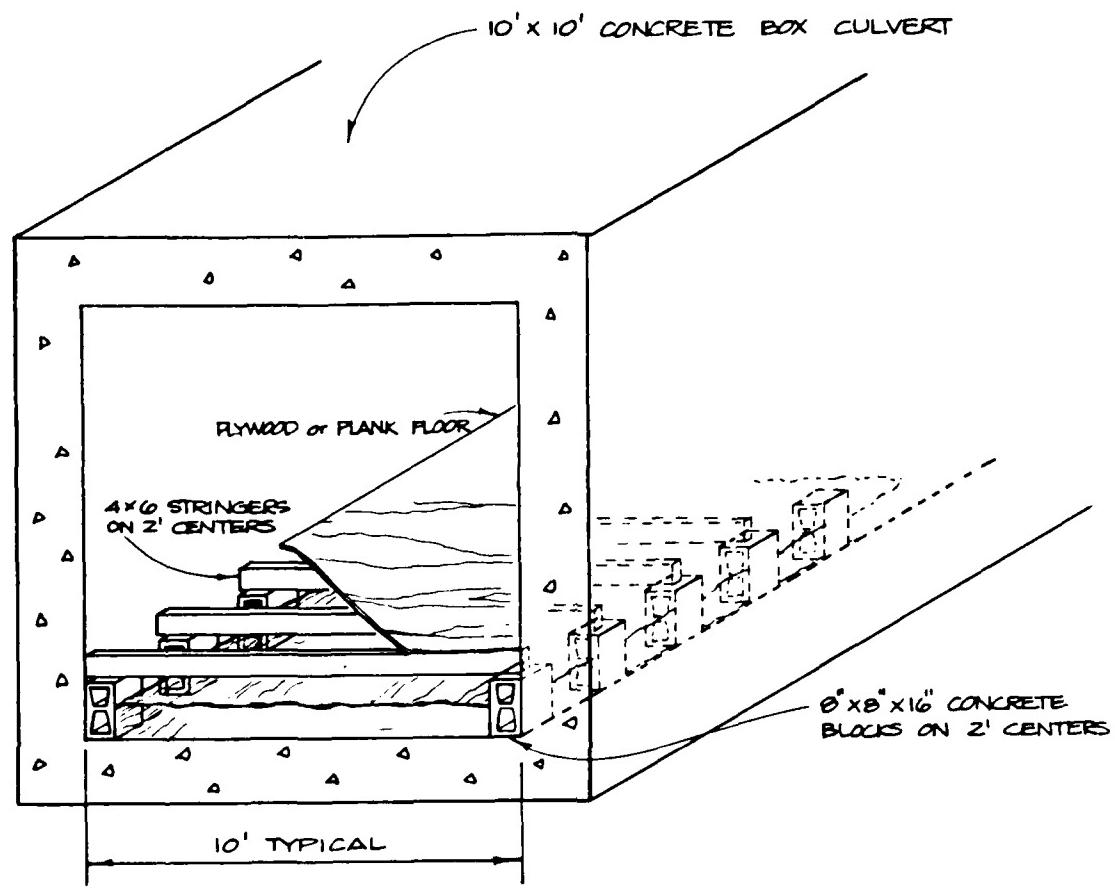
Box Culvert Key Worker Shelter With Low-Flow False Floor.
